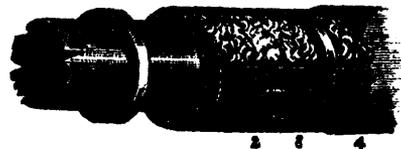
Mineral Wool within Wooden Collars, made in Sections and Protected next to the Pipes by Tin or Sheet Iron.
